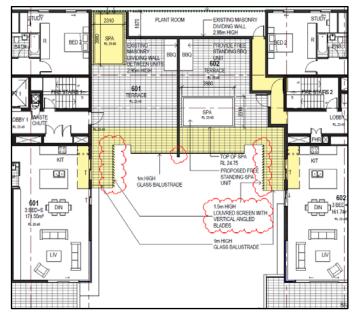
Revised Level 6 floor plans showing changes to the terraces (Source: Applicant's revised plans dated 19.2.19)
